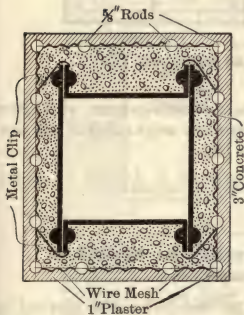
Fireproofing of Steel Columns with Concrete and Plaster
